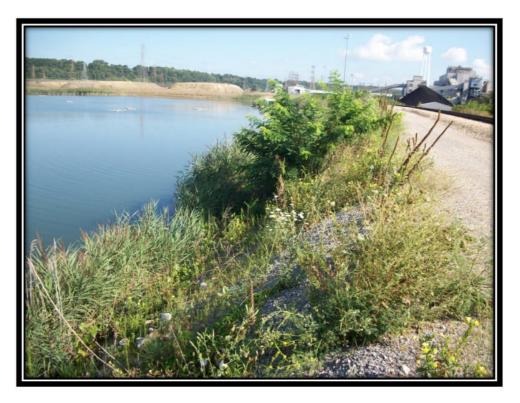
Vegetation on Upstream Slope of Clarification Pond (Note Steep Slopes)
